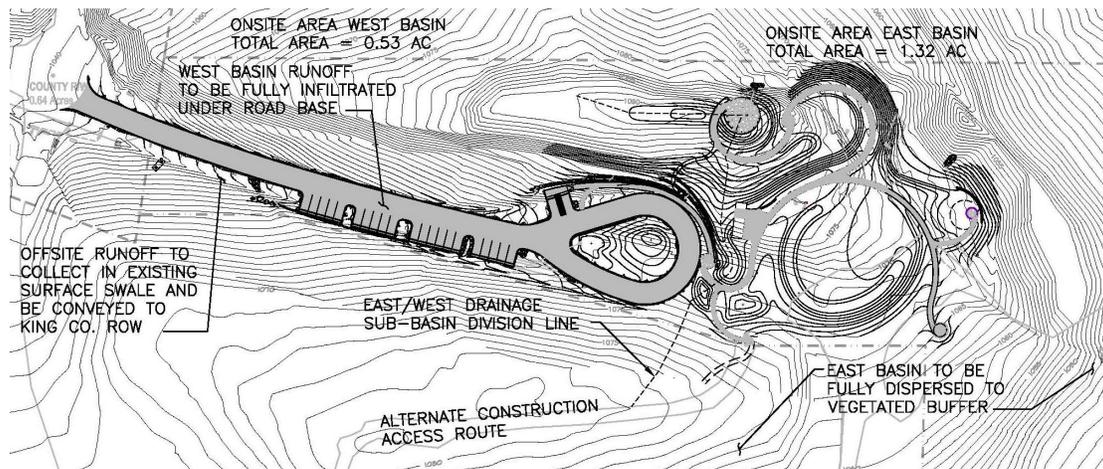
Site plan and conceptual drainage at Snoqualmie Point Community Park
